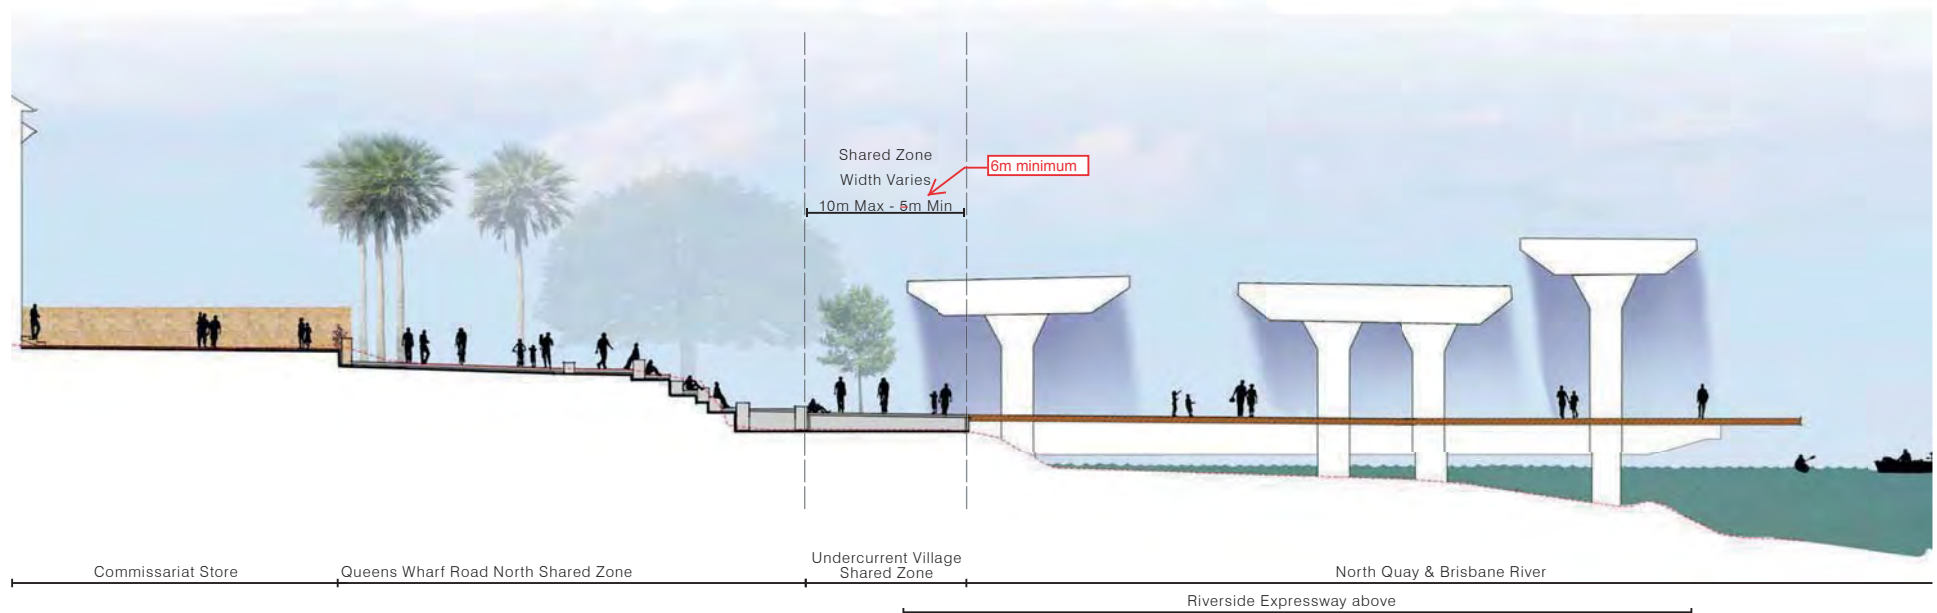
Undercurrent Village Typical Sectional Elevation (Not to scale)
